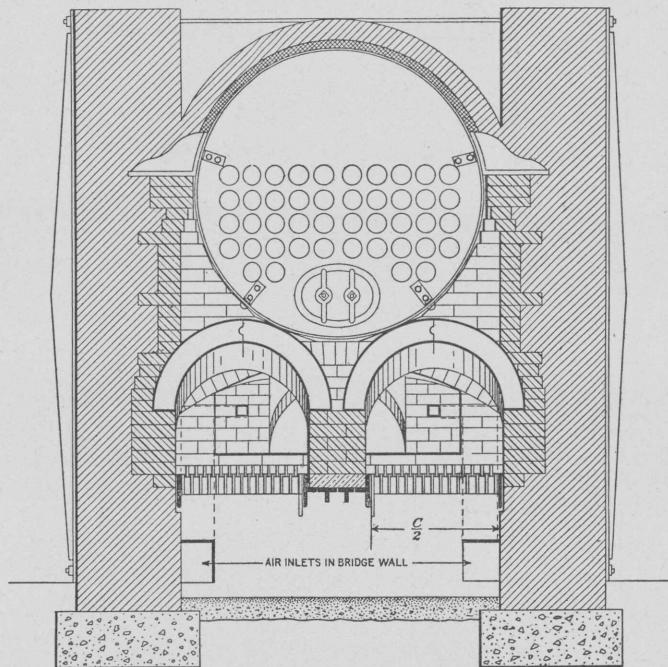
A hand-fired furnace and return tubular boiler, cross section.
